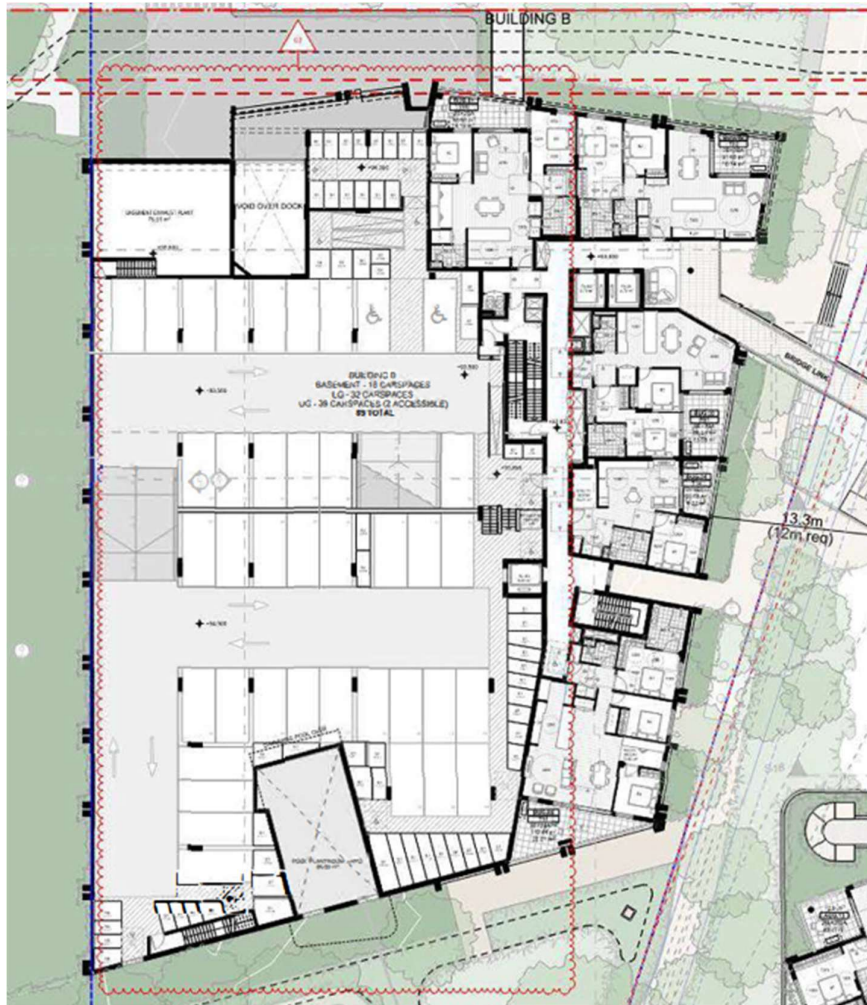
Approved and Proposed Upper Ground Level Stage 01 of Building B (1 of 2)
